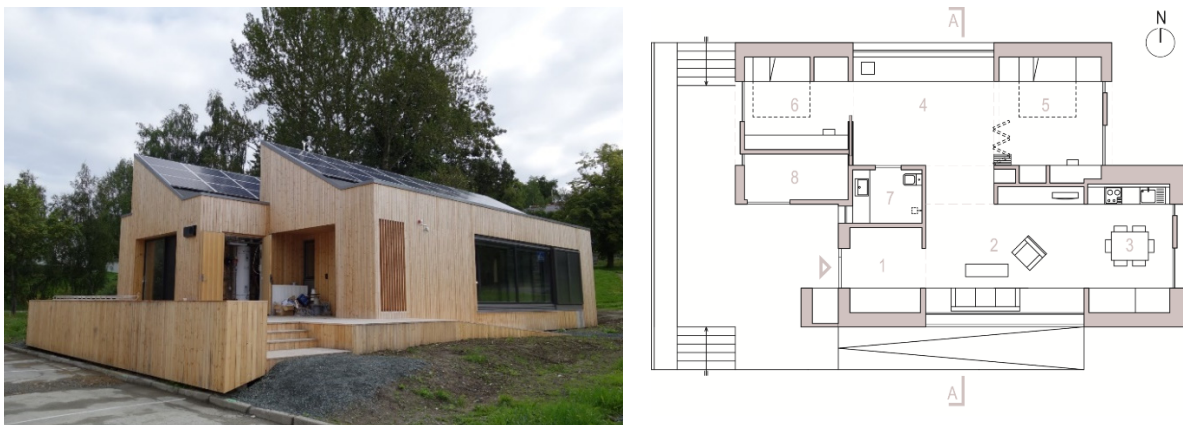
Left: Zeb Living Laboratory with two parallel PV-roofs. Right: The floor plan of the house consists of combined living room and kitchen and two bedrooms. Illustration: Gabrielle Lobacarro
